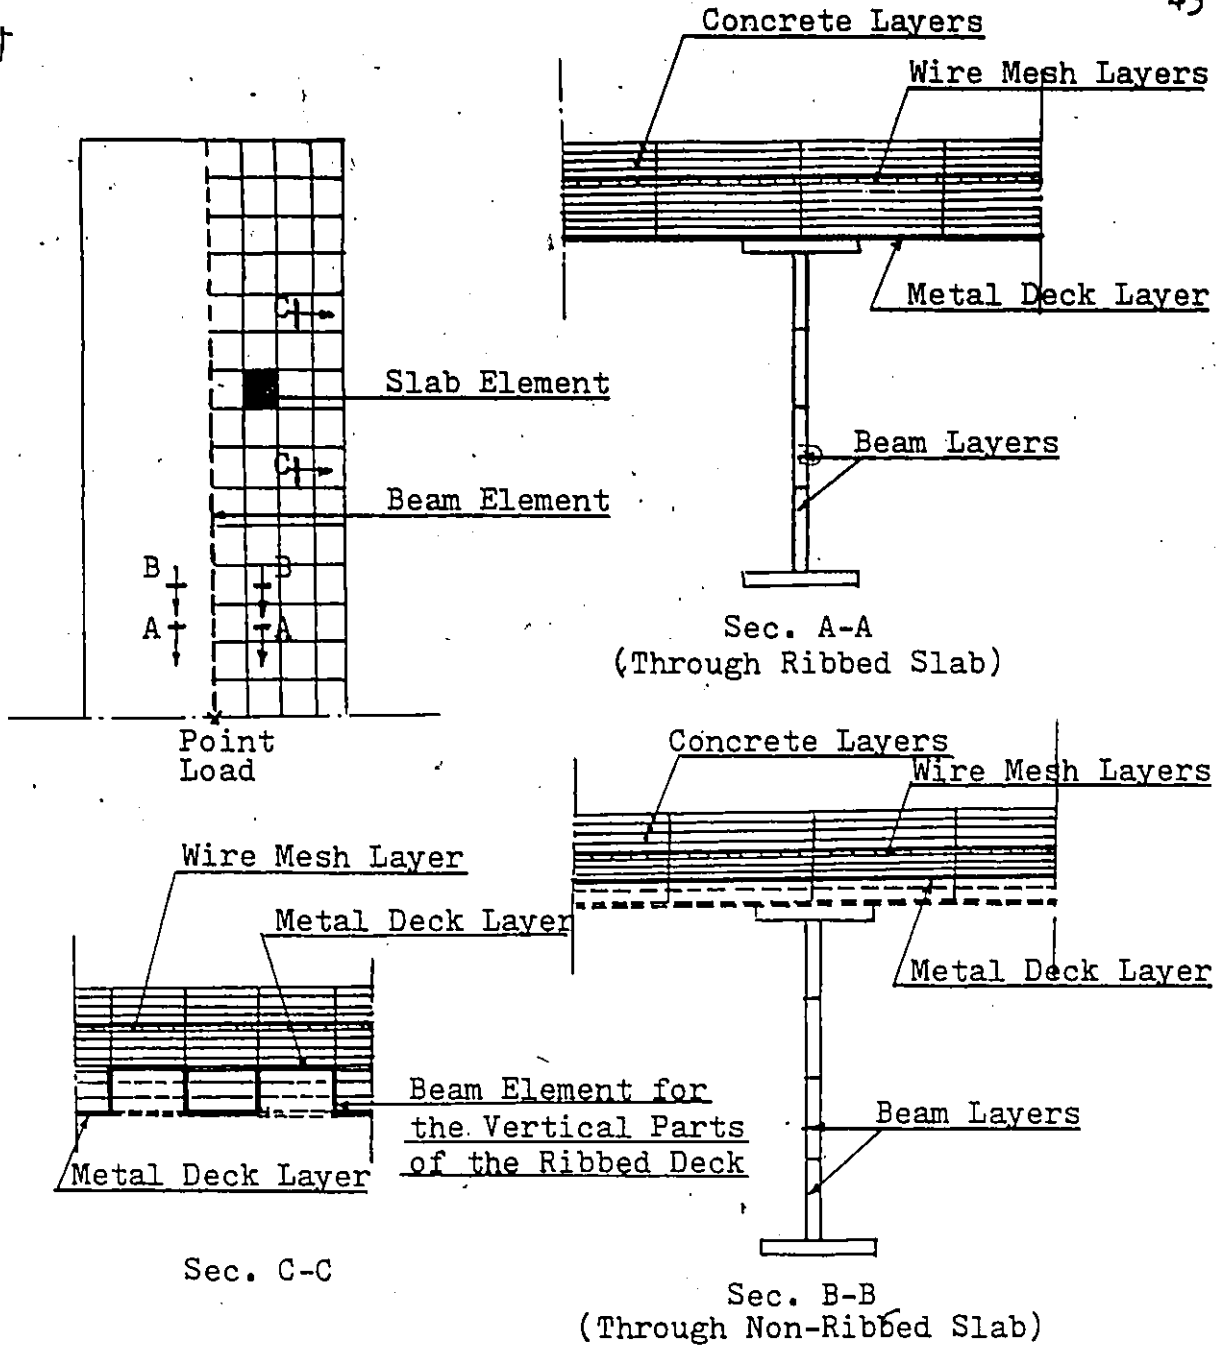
Layered Finite Element Grid for a Composite Beam with a Ribbed Metal Deck
